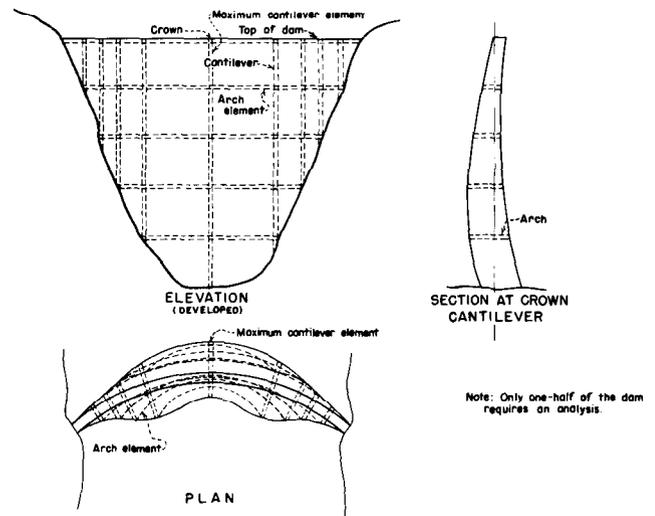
Plan, profile, and section of a symmetrical arch dam.—288-D-2680
